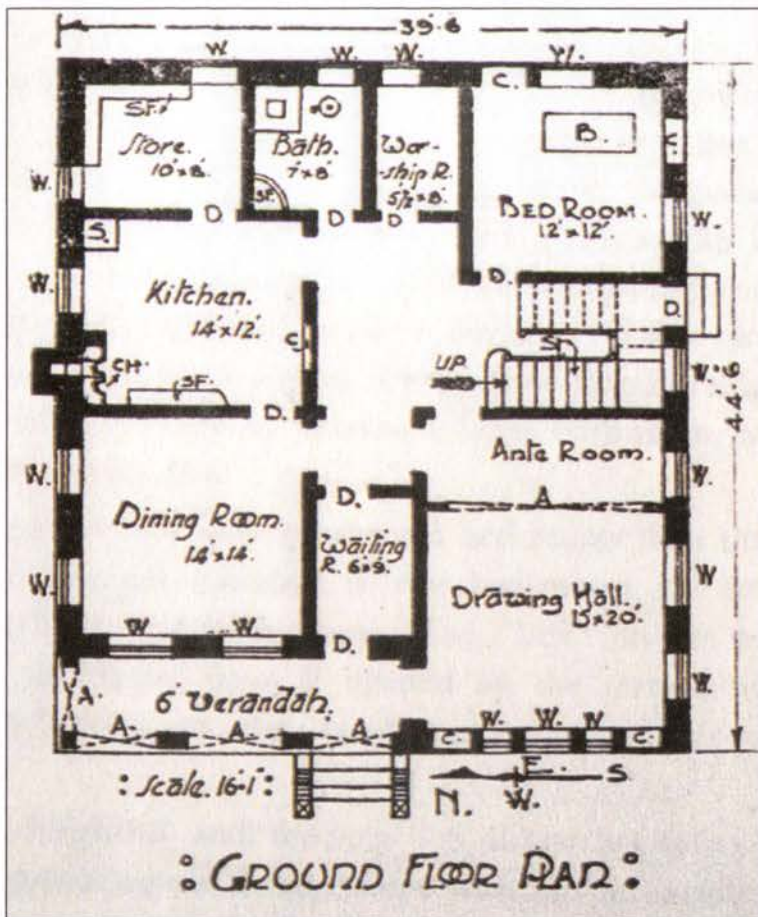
Typical Ground floor plan of a Model Apartment.<sup>97</sup>
